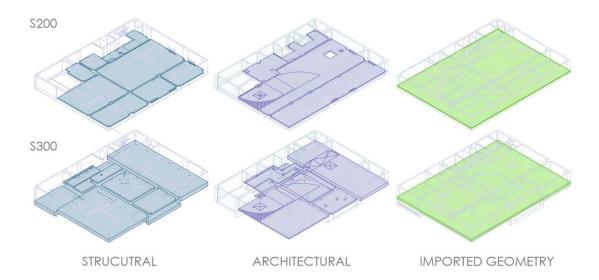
FLOOR SLABS FOR S300 AND S200.
